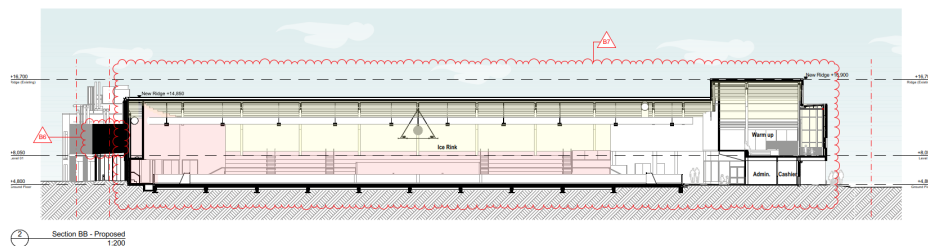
Section BB Proposed Vertical Cross Section (Source: Kennedy Associates Architects 2024 2221-DA300 Rev C)
